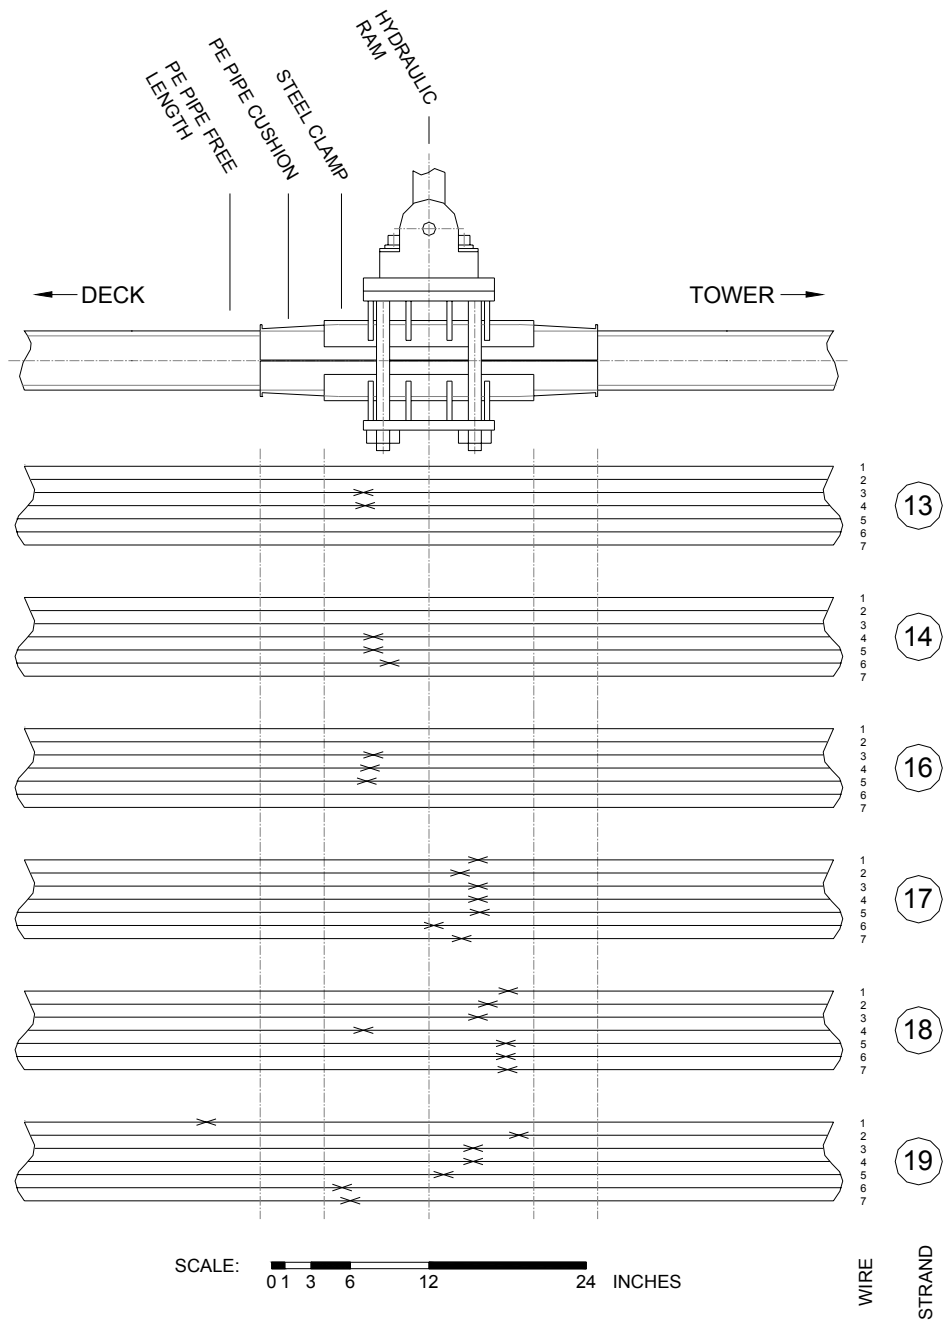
Location of wire breaks under the load point - Specimen 9
